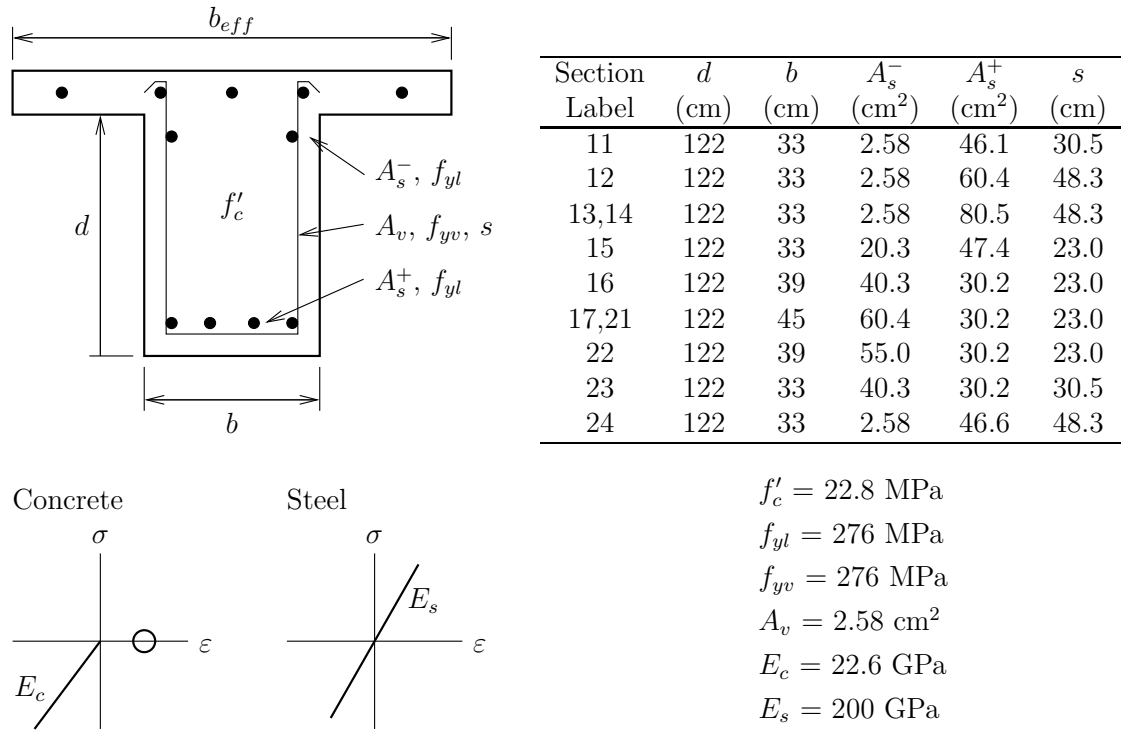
Typical reinforcing layout and details for an interior girder of the McKenzie River Bridge.
